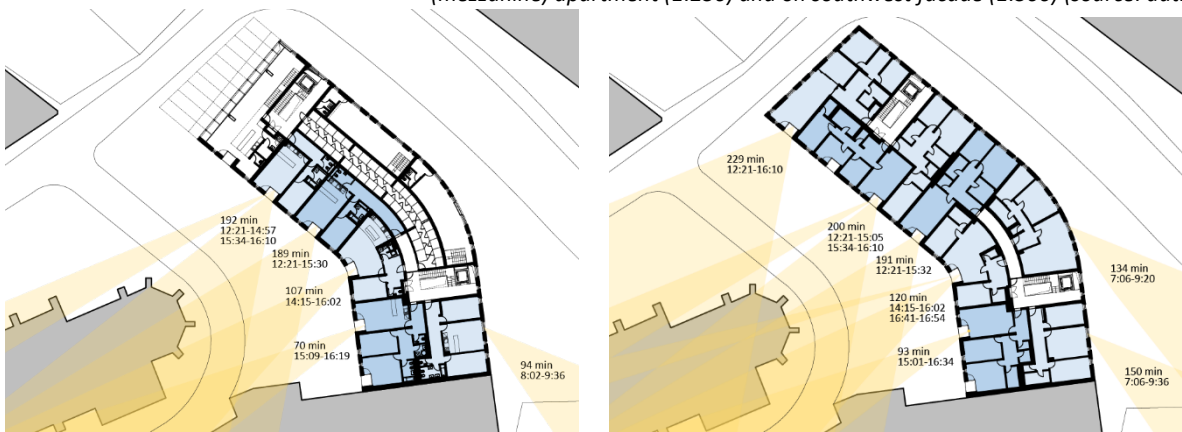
Apartment House Ostravská Brána sunlight in apartments on upper 1<sup>st</sup> floor (left) and 3<sup>rd</sup> floor (right) in urban context (1:1000) (source: author)
